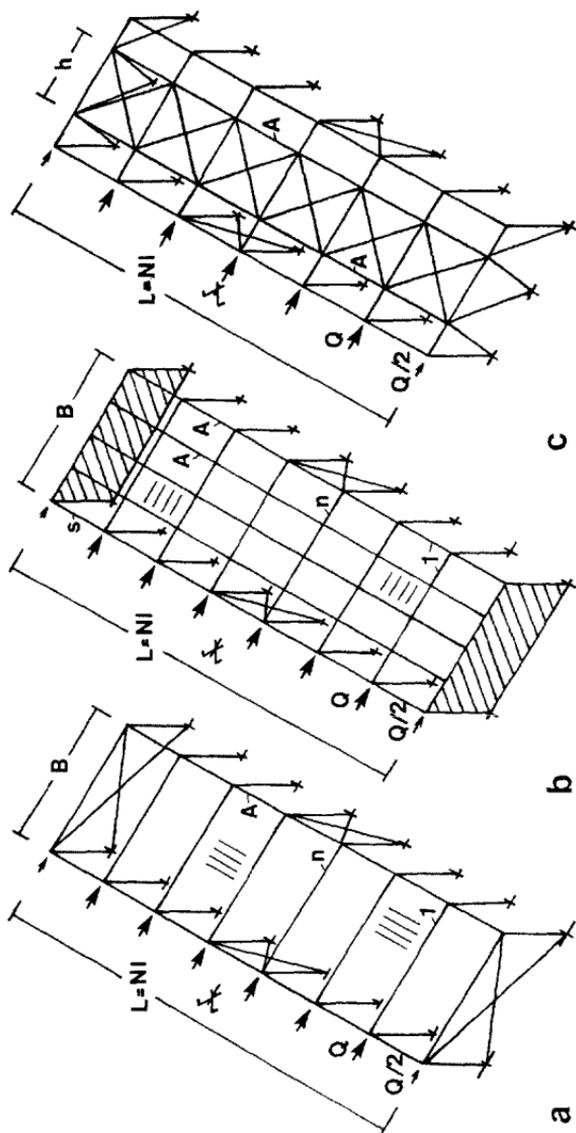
a) Structure of a flat-roofed building consisting of end gables, transverse frames, vertical longitudinal bracings, edge purlins and a decking built-up of corrugated metal sheets spanning in the building's longitudinal direction. b) Similar structure, the decking of which spans in the building's transverse direction. c) Similar structure in which the roof's longitudinal bracing is provided by a truss
